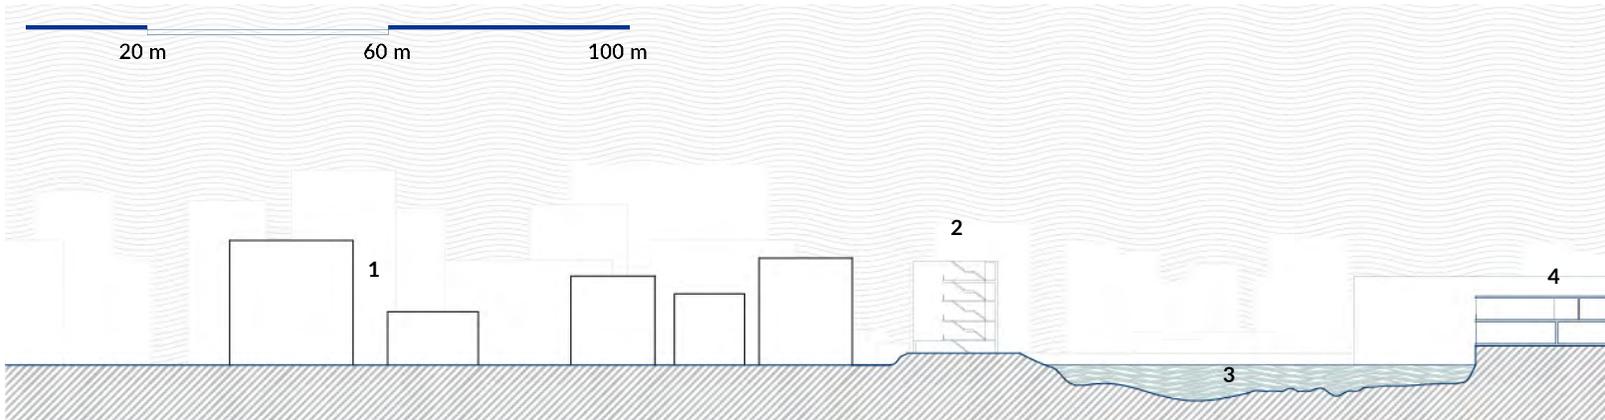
Site Section B 1:1250. Refer to Figure 5.5 for section cut markers.
